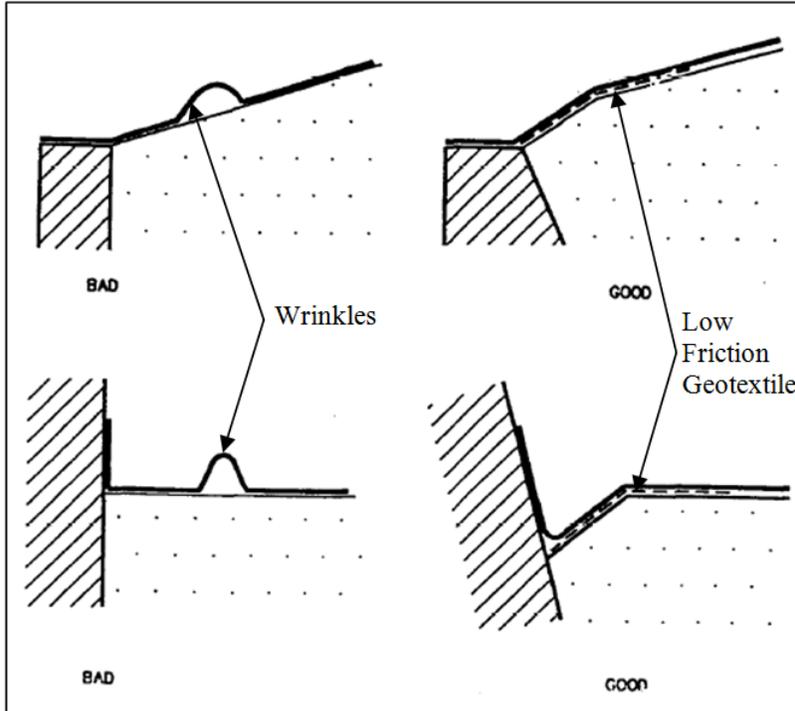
Correct connection between geomembrane and concrete structures [40].
